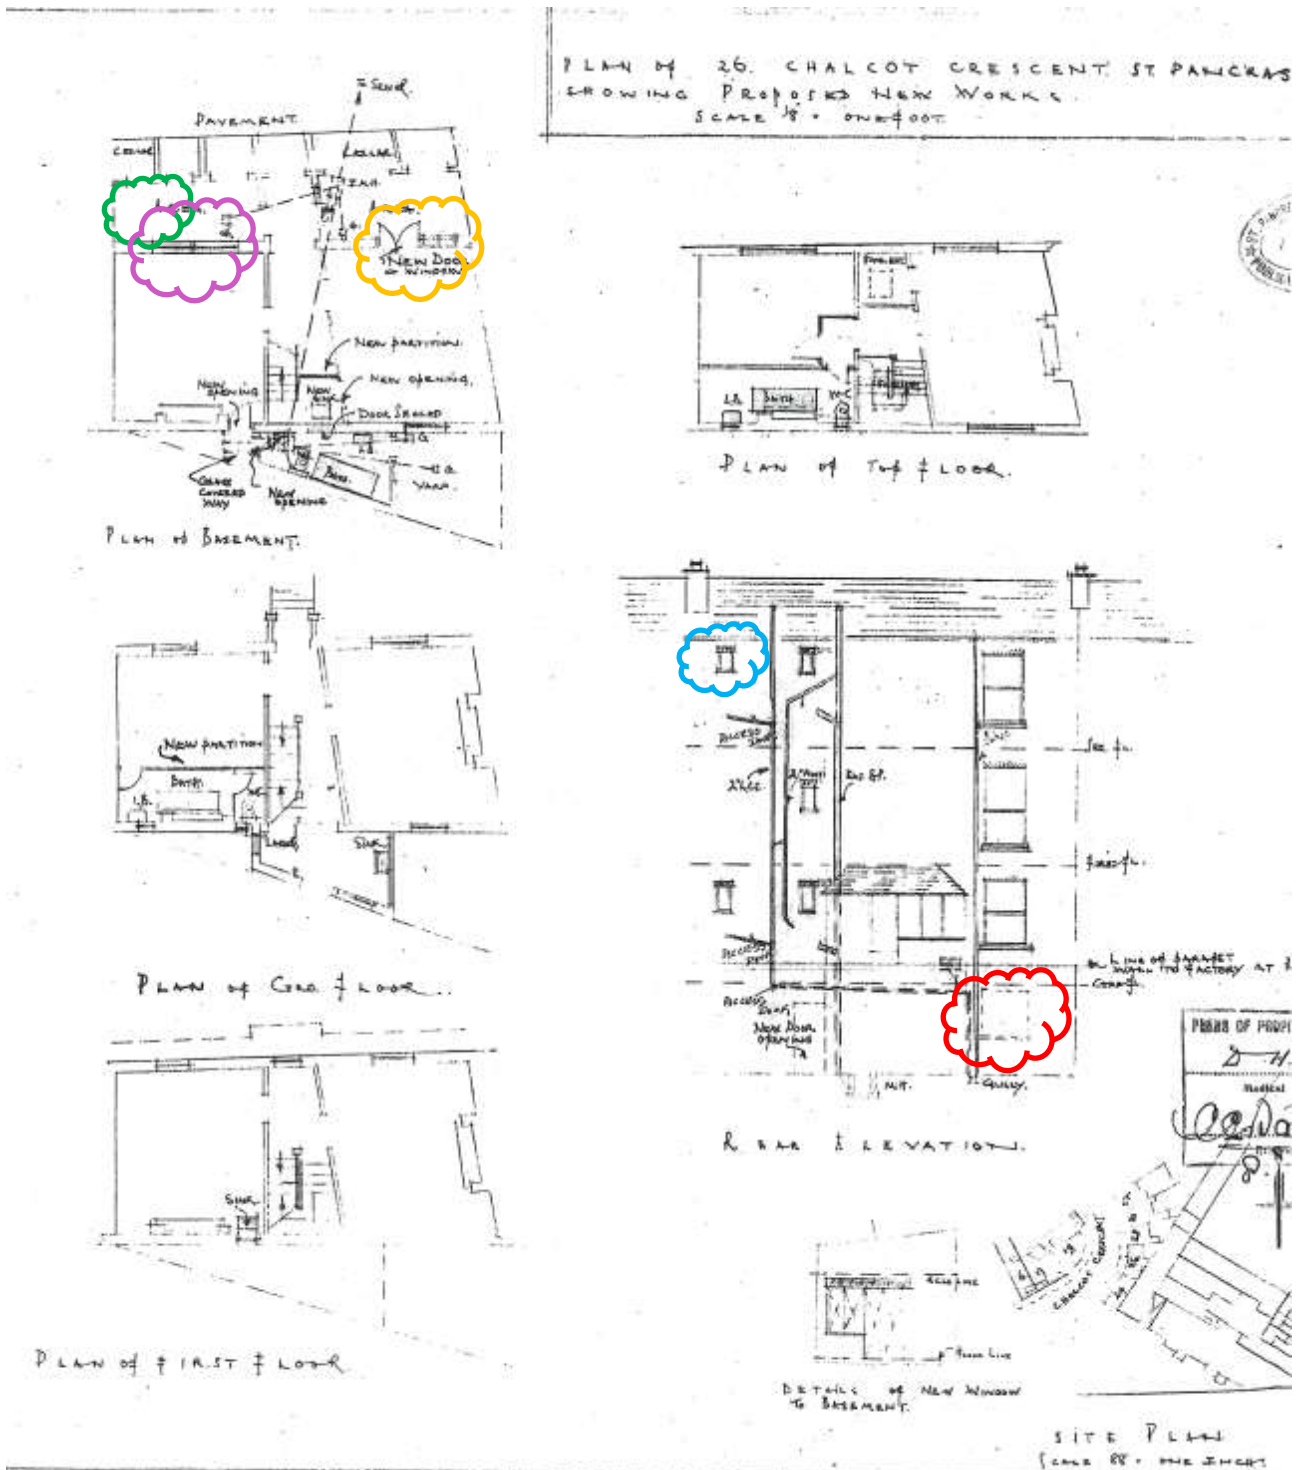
Drawings of No. 26 Chalcot Crescent. Dated 1953. This depicts proposed works to individual rooms and elevations at No. 26. Amendments are not all highlighted due to their considerable number and extent. This includes several new partitions and elevations within internal spaces, as well as revised openings to the front and rear envelope of the property. Note at this point there was still no external staircase shown within the southern lightwell (green cloud), although an internal basement stair was still present. By this point the door to the southern lightwell had been replaced by the present metal framed window (pink cloud) and it was proposed that the door and window to the northern lightwell (yellow cloud) and rear courtyard (red cloud) were to be replaced. The window opening at top floor level of rear façade (no longer present) is shown in blue. Source: Camden Archive Centre (accessed 21st August 2018).
